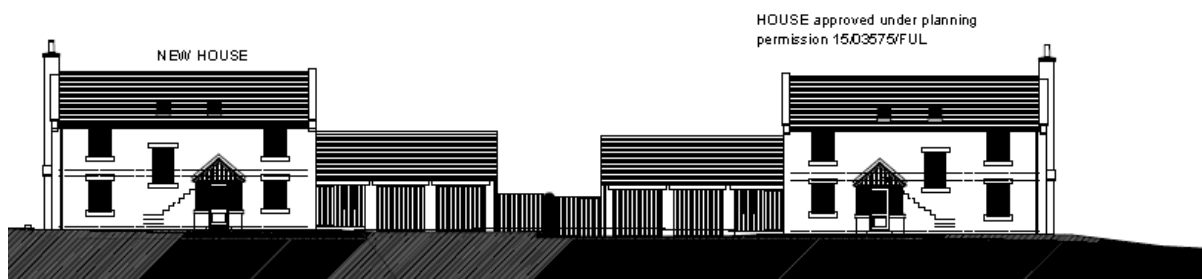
Eastern (roadside) Elevation of proposed dwelling. Note the traditional appearance, linear formation and stepping down from the main house to the garage, which is reminiscent of a traditional farmhouse.
